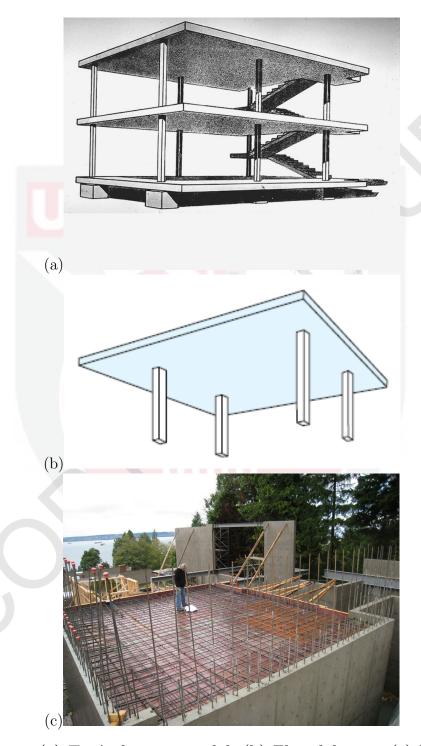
(a) Typical concrete slab (b) Flat slab type (c) Reinforcement layout
